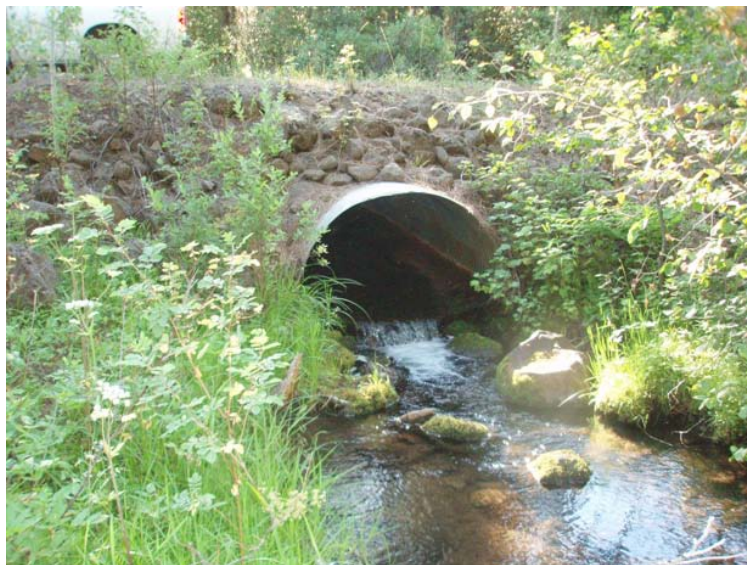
Culvert on FS Road 143 at the Fawn Creek crossing, looking at the outlet after replacement.
